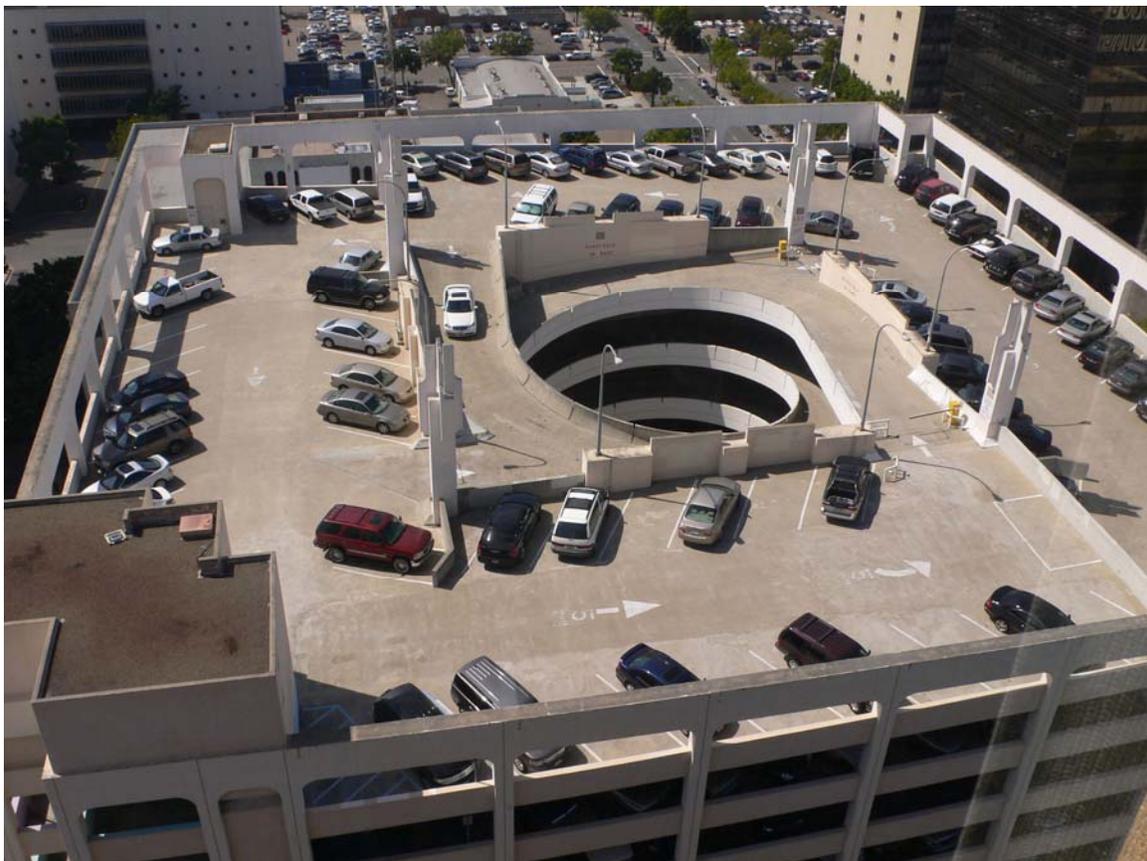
Evan Jones Parkade, looking west, rooftop elevation.
